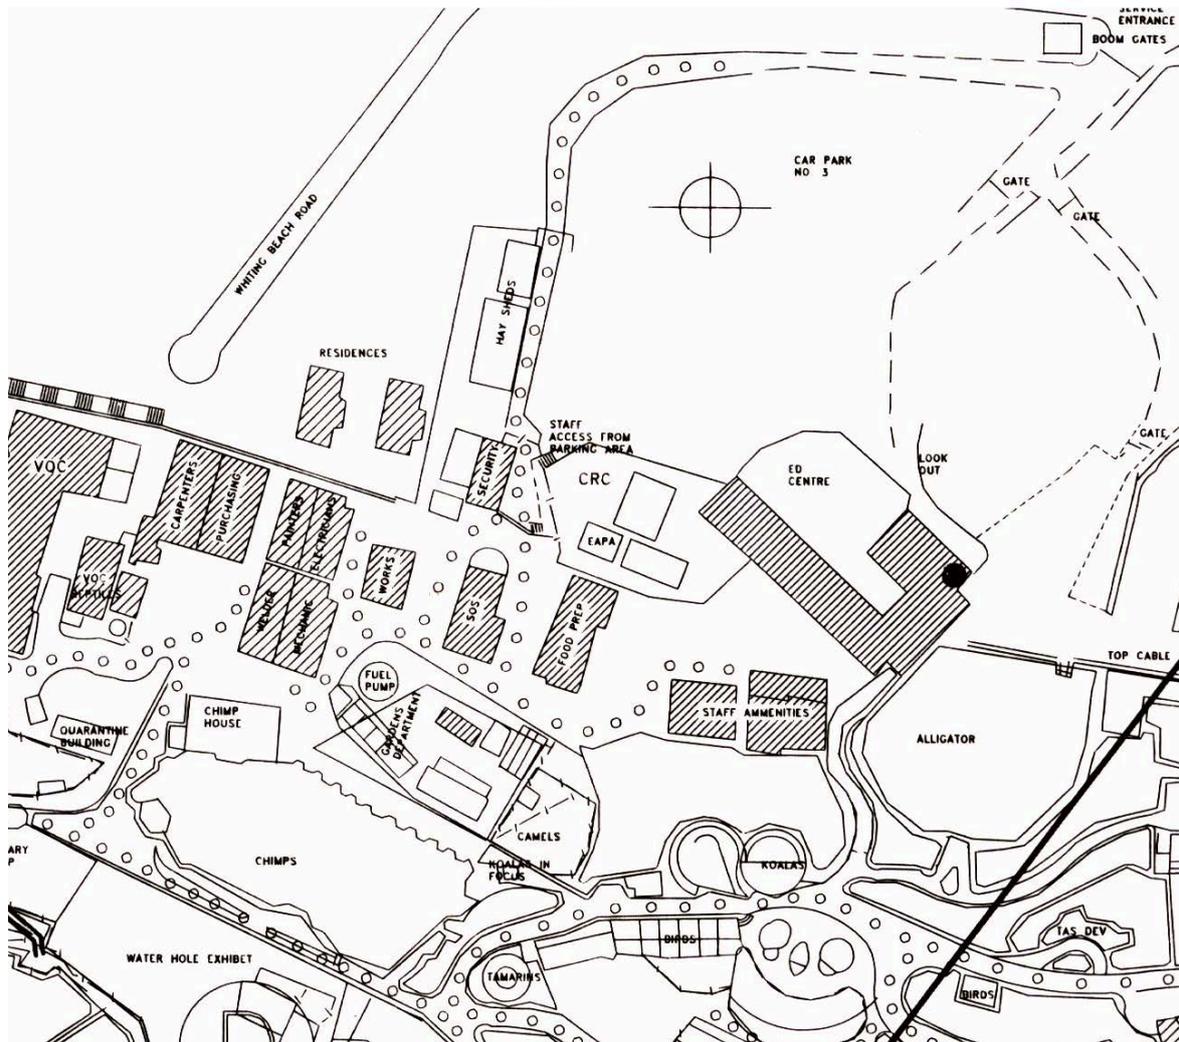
Part of a 1992 site plan showing the present study area immediately prior to the construction of the current reptile complex. Note the breach in the former northern boundary wall and the addition of food storage buildings (the present metal sheds) along the western side of the earlier *ad hoc* northern car park. (Source: TCSA Archives)
